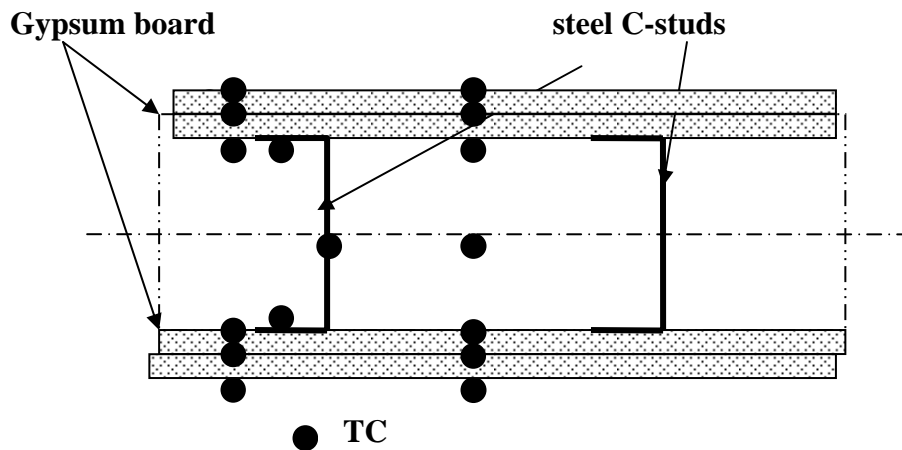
Cross-section for thermocouple (TC) layout – Wall Nos. 2 & 3.
